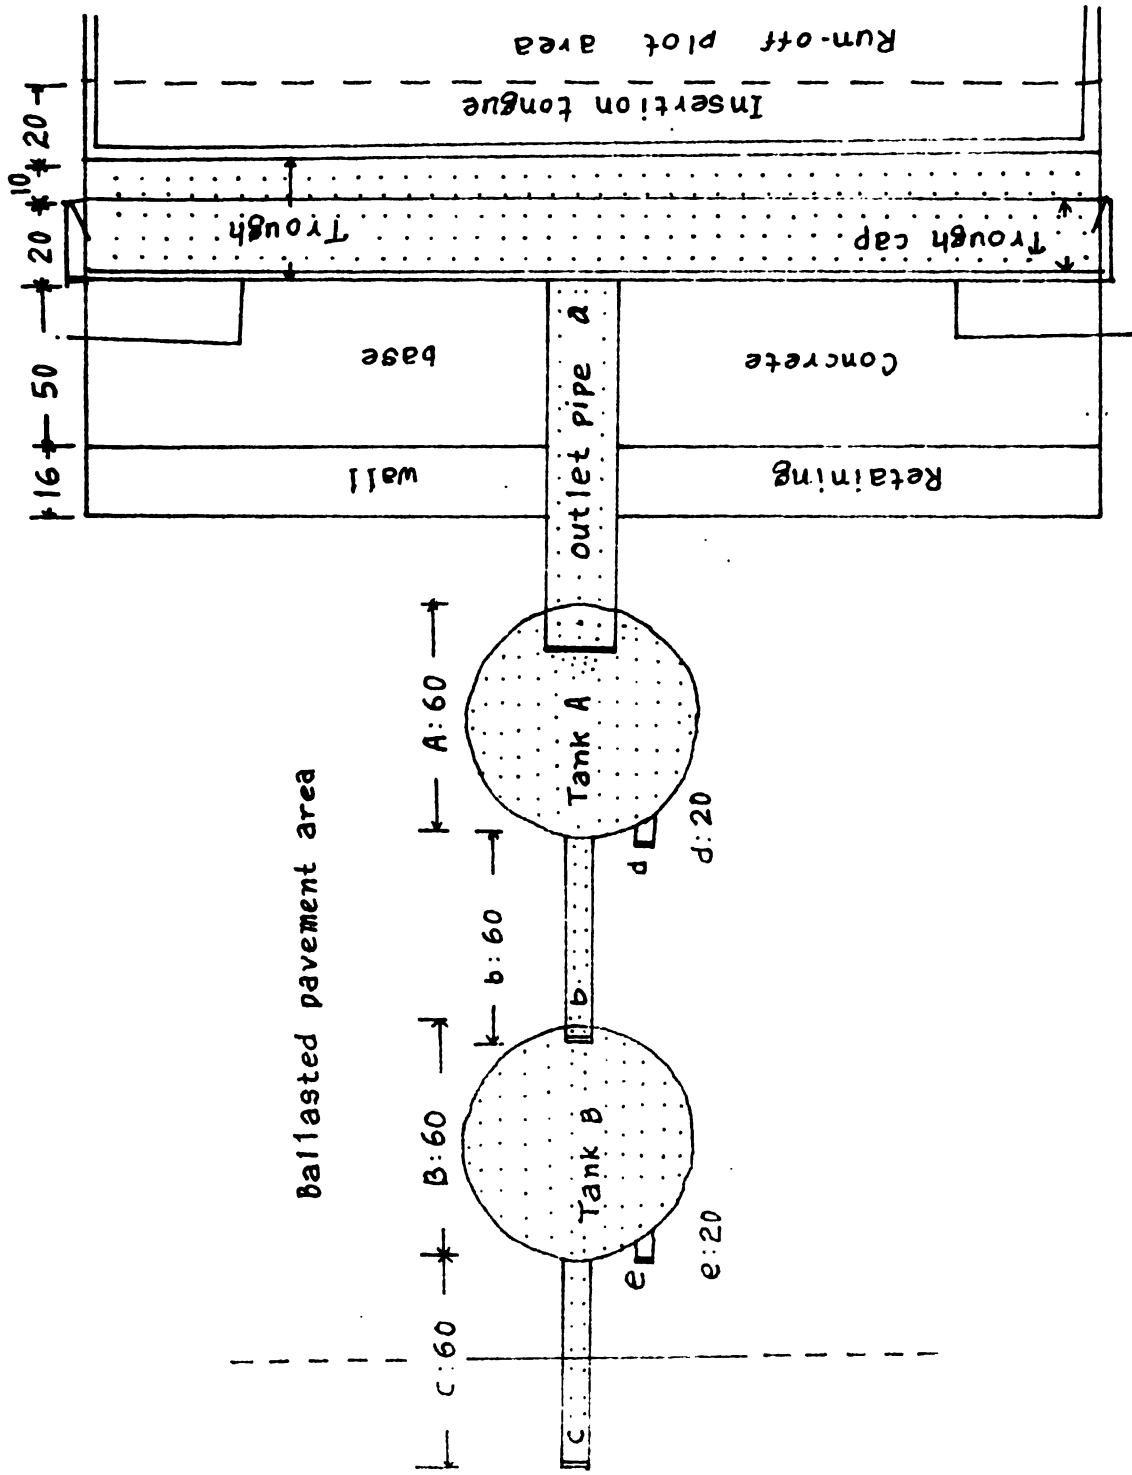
Top-view of tank A & B, outlet a, b, c, d, e, trough, retaining wall and concrete base (Unit : cm)
